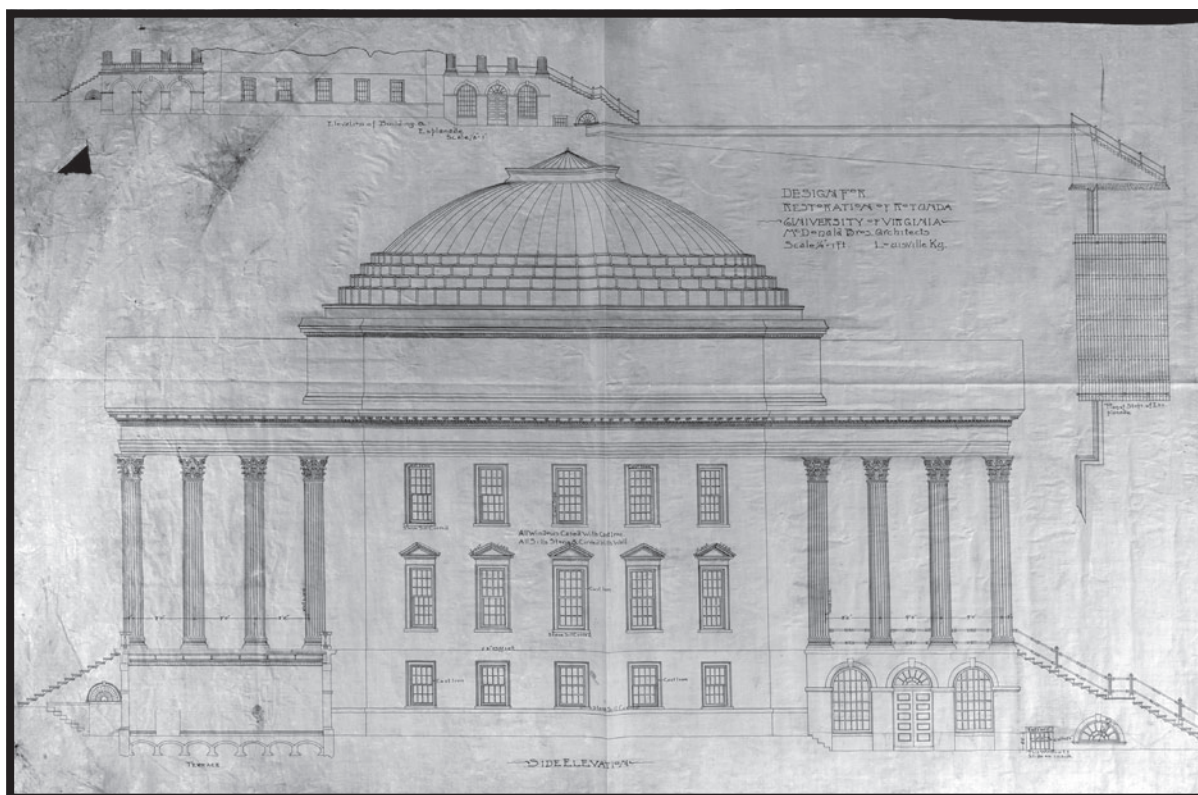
McDonald Brothers, drawing for the restoration of the east elevation, ca. 1895, showing a proposed north portico mirroring the south portico.
